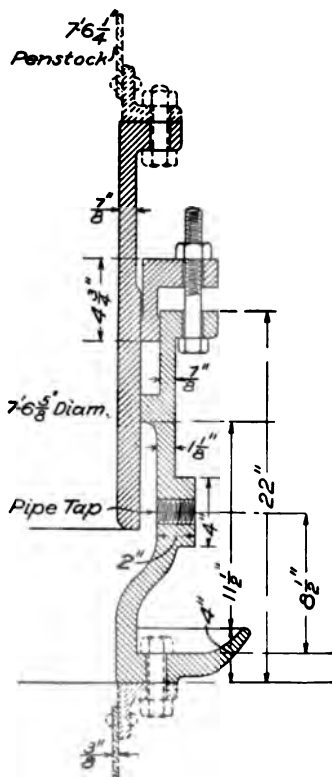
Penstock Expansion Joint, Niagara Falls Power Company.
